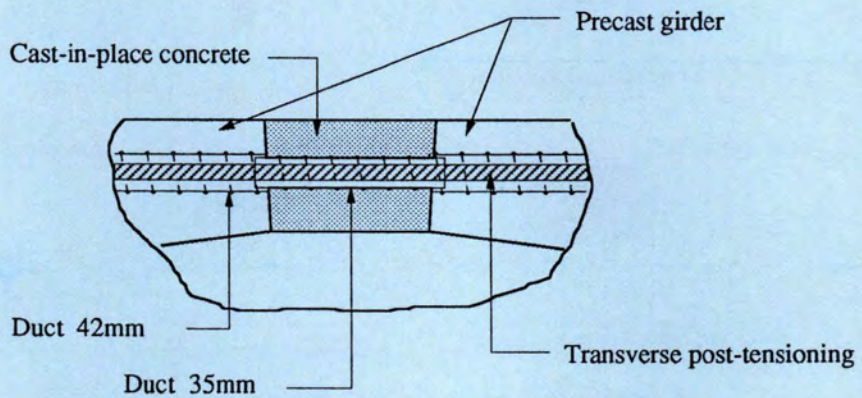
Example of transverse post-tensioning for pretensioned box girder bridge with span of 20 m and TL-20 loading.
